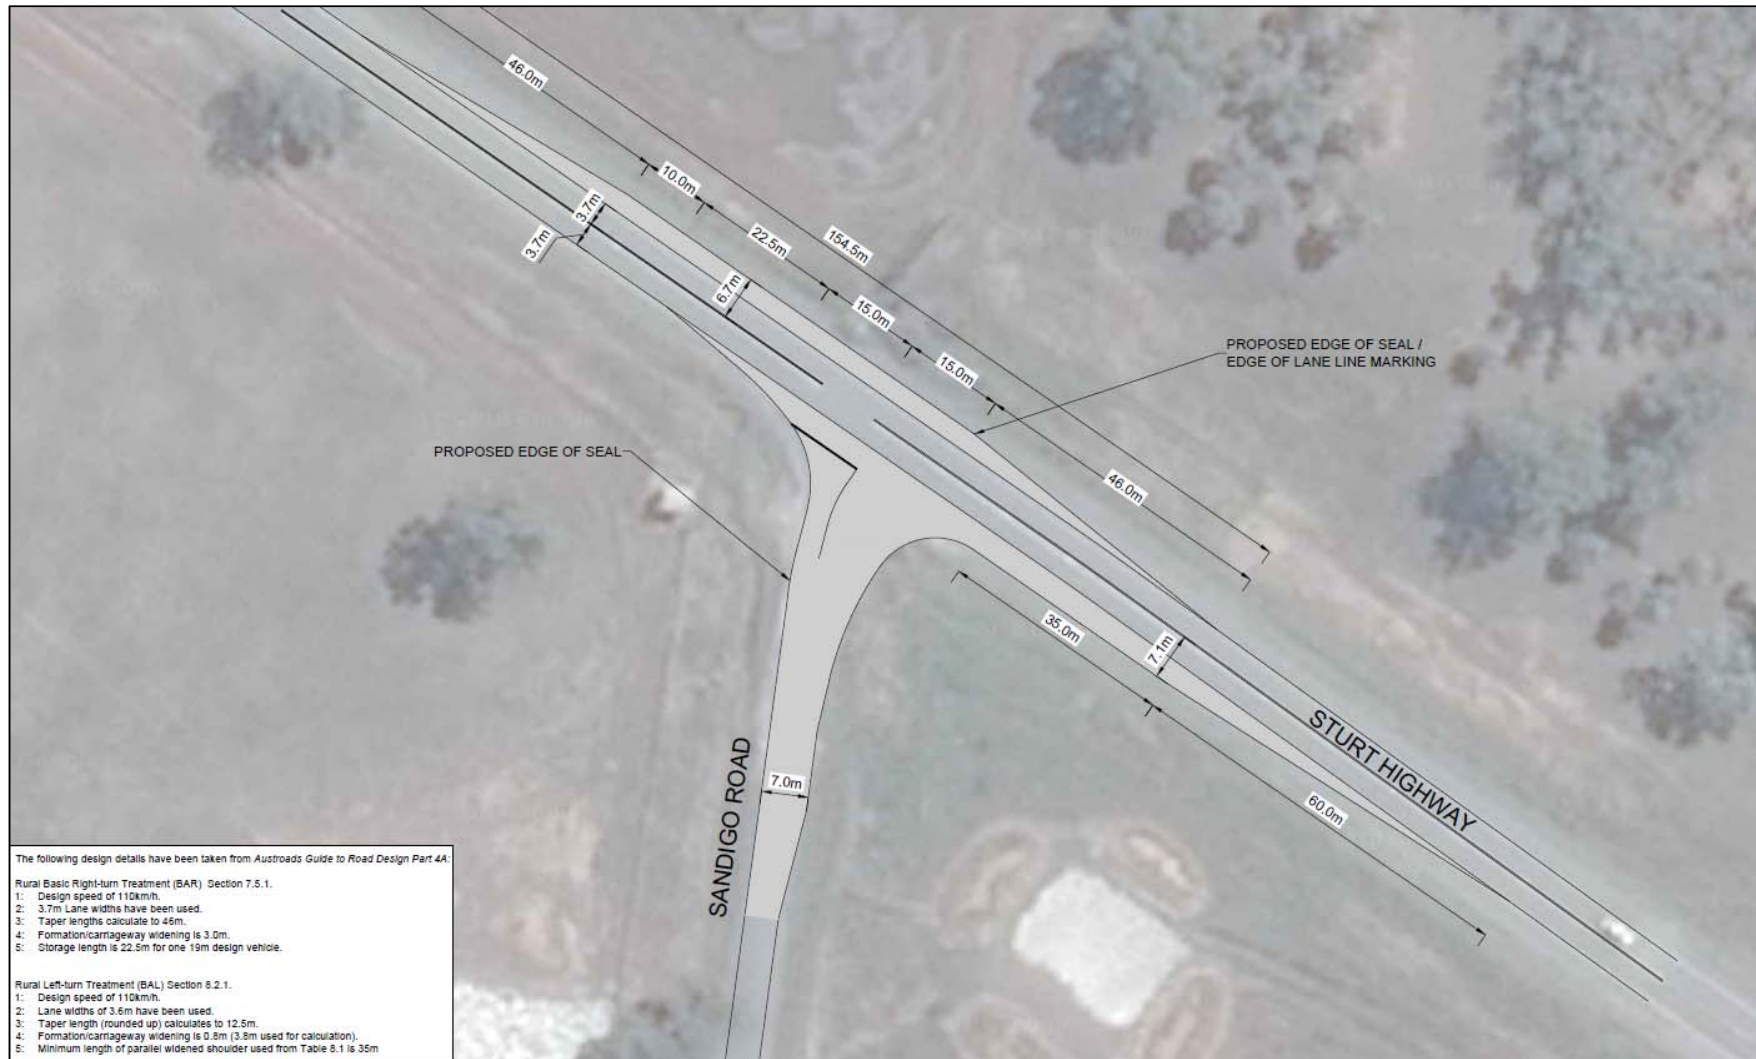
Proposed intersection upgrade of Sandigo Road / Sturt Highway
